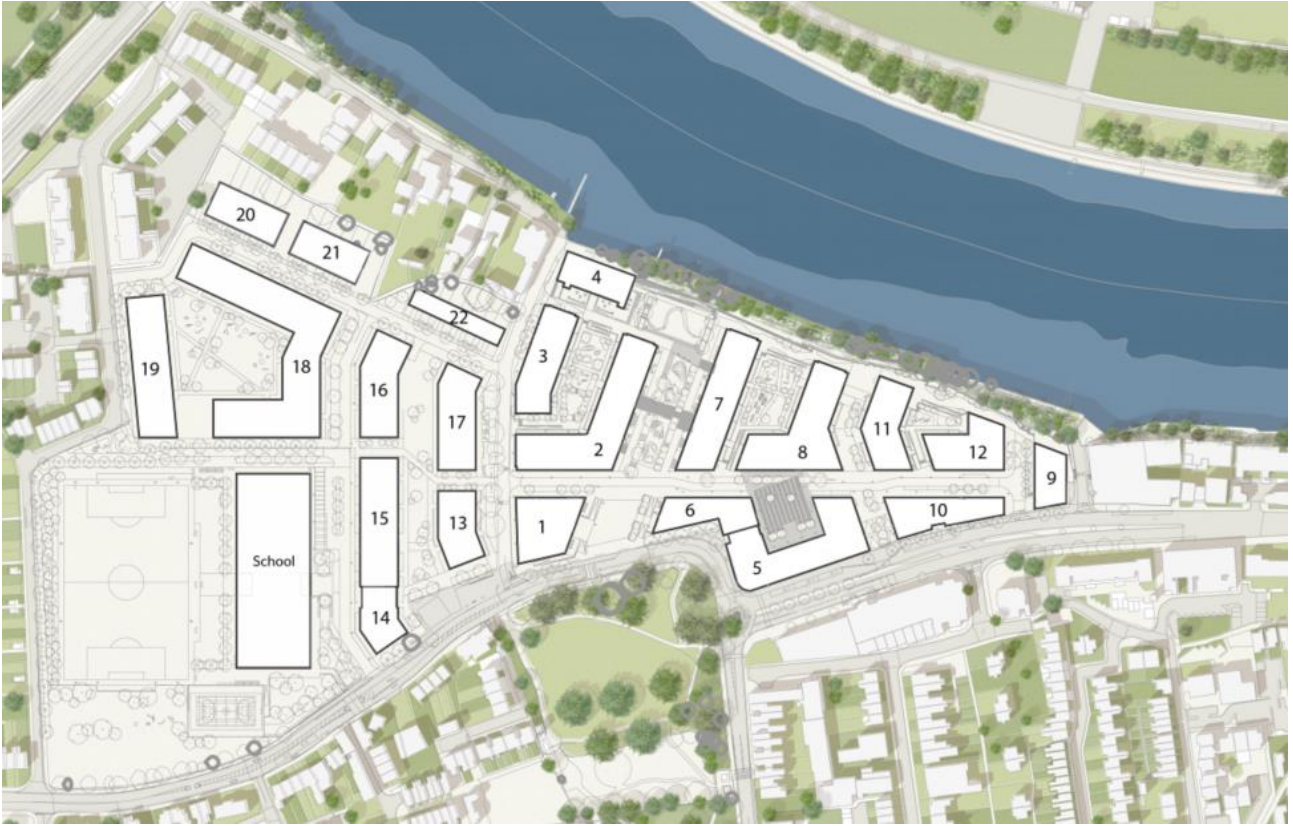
Proposed Stag Brewery Site Numbering Plan.
